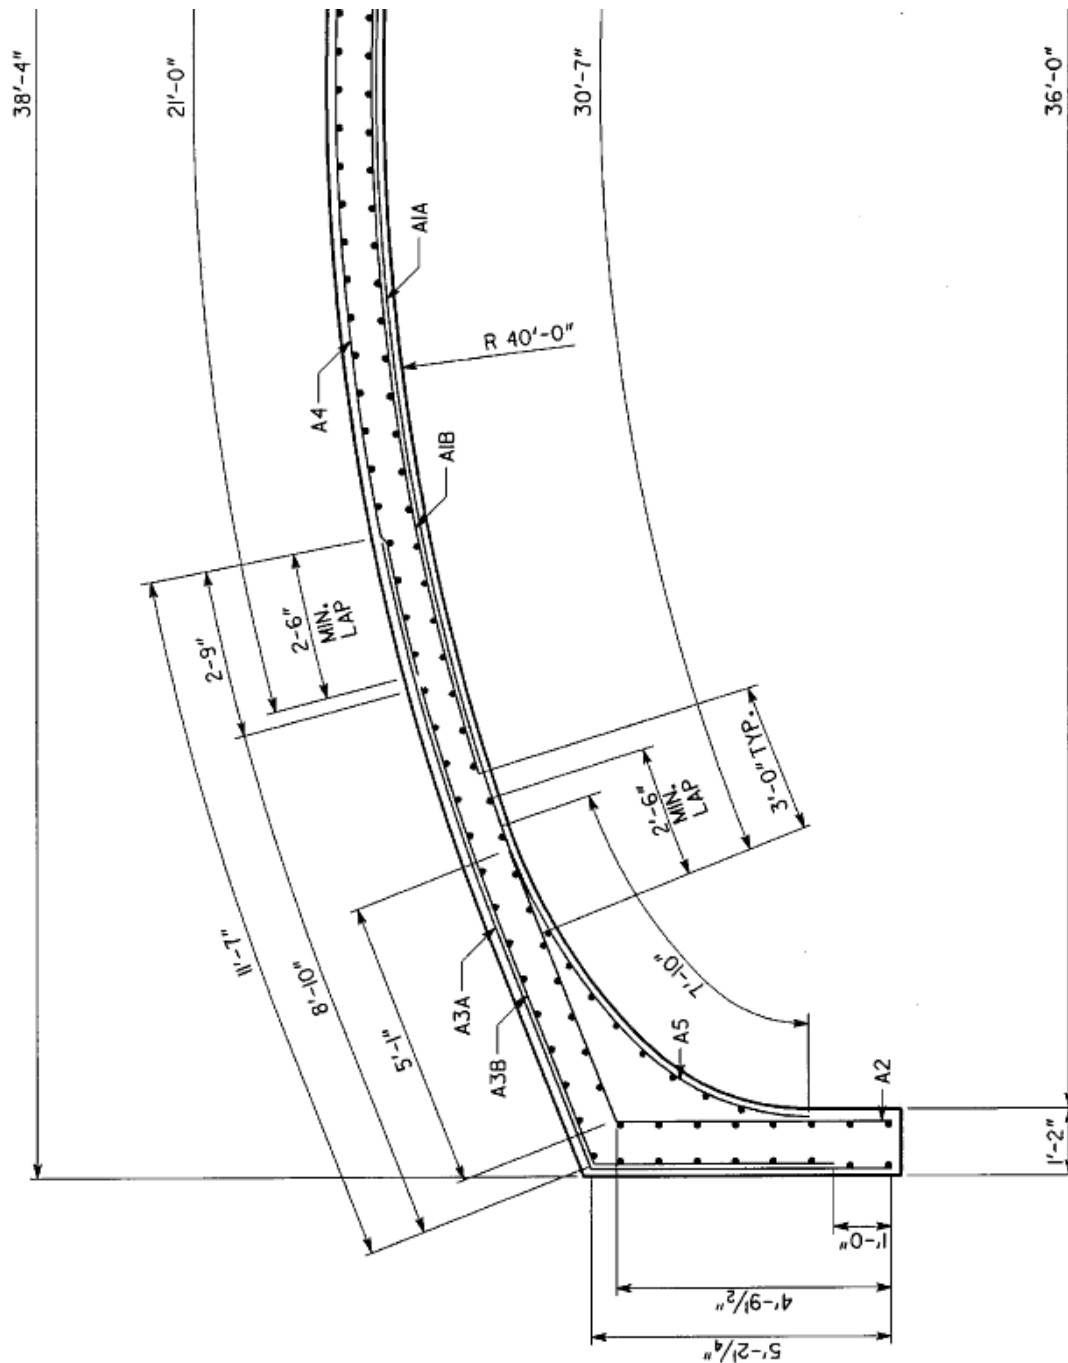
36 ft Bridge Unit Reinforcement Layout (FoleyArch, 2011)
